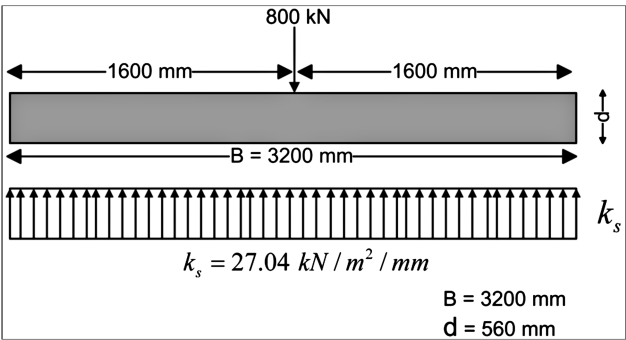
C.2 Details of loading and modulus of the subgrade reaction of a beam resting on an elastic foundation (Example 12.1).
